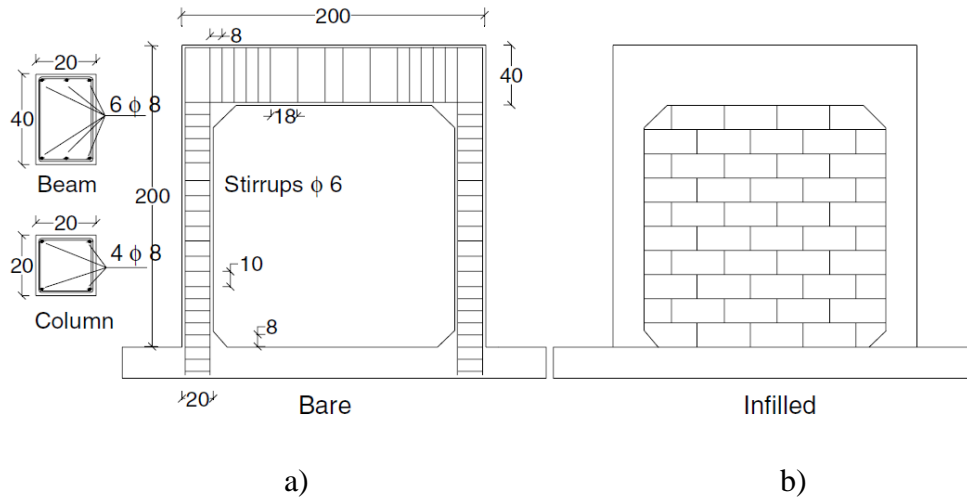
a) Single-story single-bay RC frame. Cross-section and detailing of RC elements. b) Single-story single-bay infilled masonry RC frame. (Cavaleri et al., 2004).
